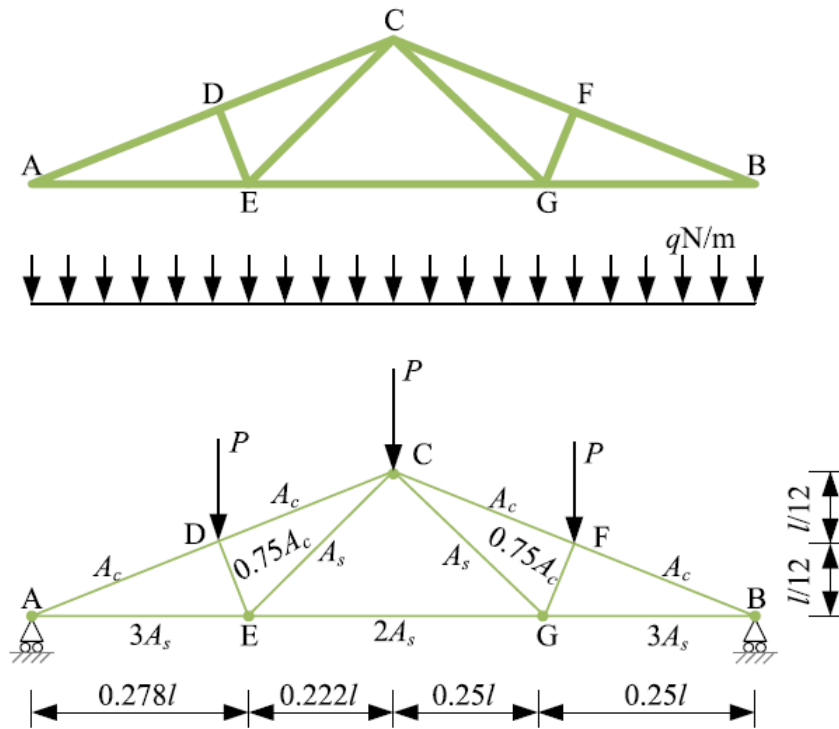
The roof truss structure [Jiang et al., 2020]
